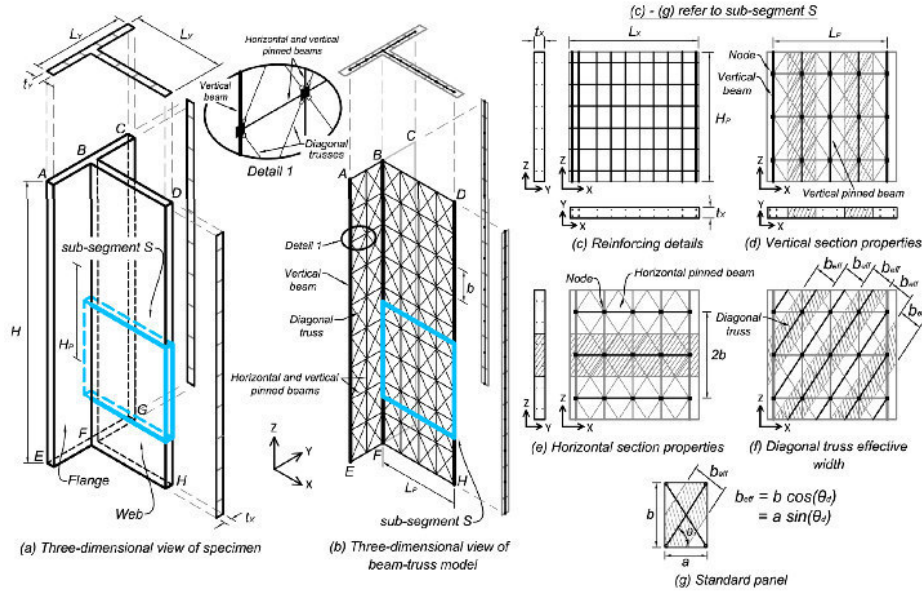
Formulation of beam-truss model for a T-shape section wall [Lu and Panagiotou 2013]
